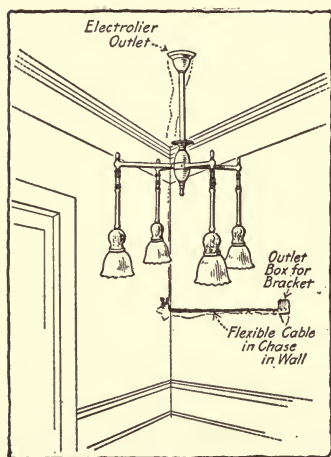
Electrolier and wall bracket outlets in front parlor.
